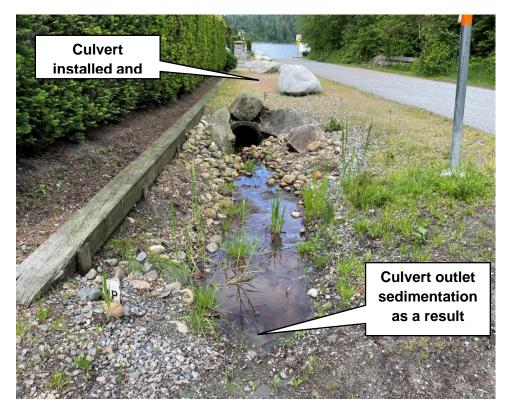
INFILLED AND LANDSCAPED DITCH/SWALE RESULTING IN SEDIMENTATION AT CULVERT OUTLET
